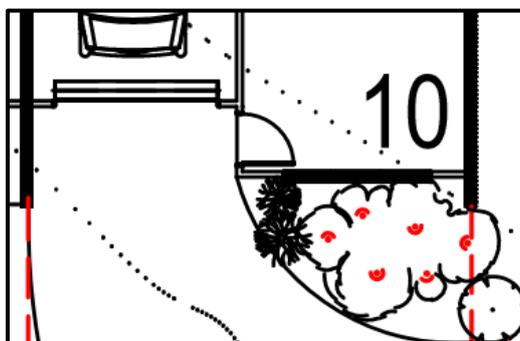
Unit 10 site plan for 21 Coleman Street, Moonah.
